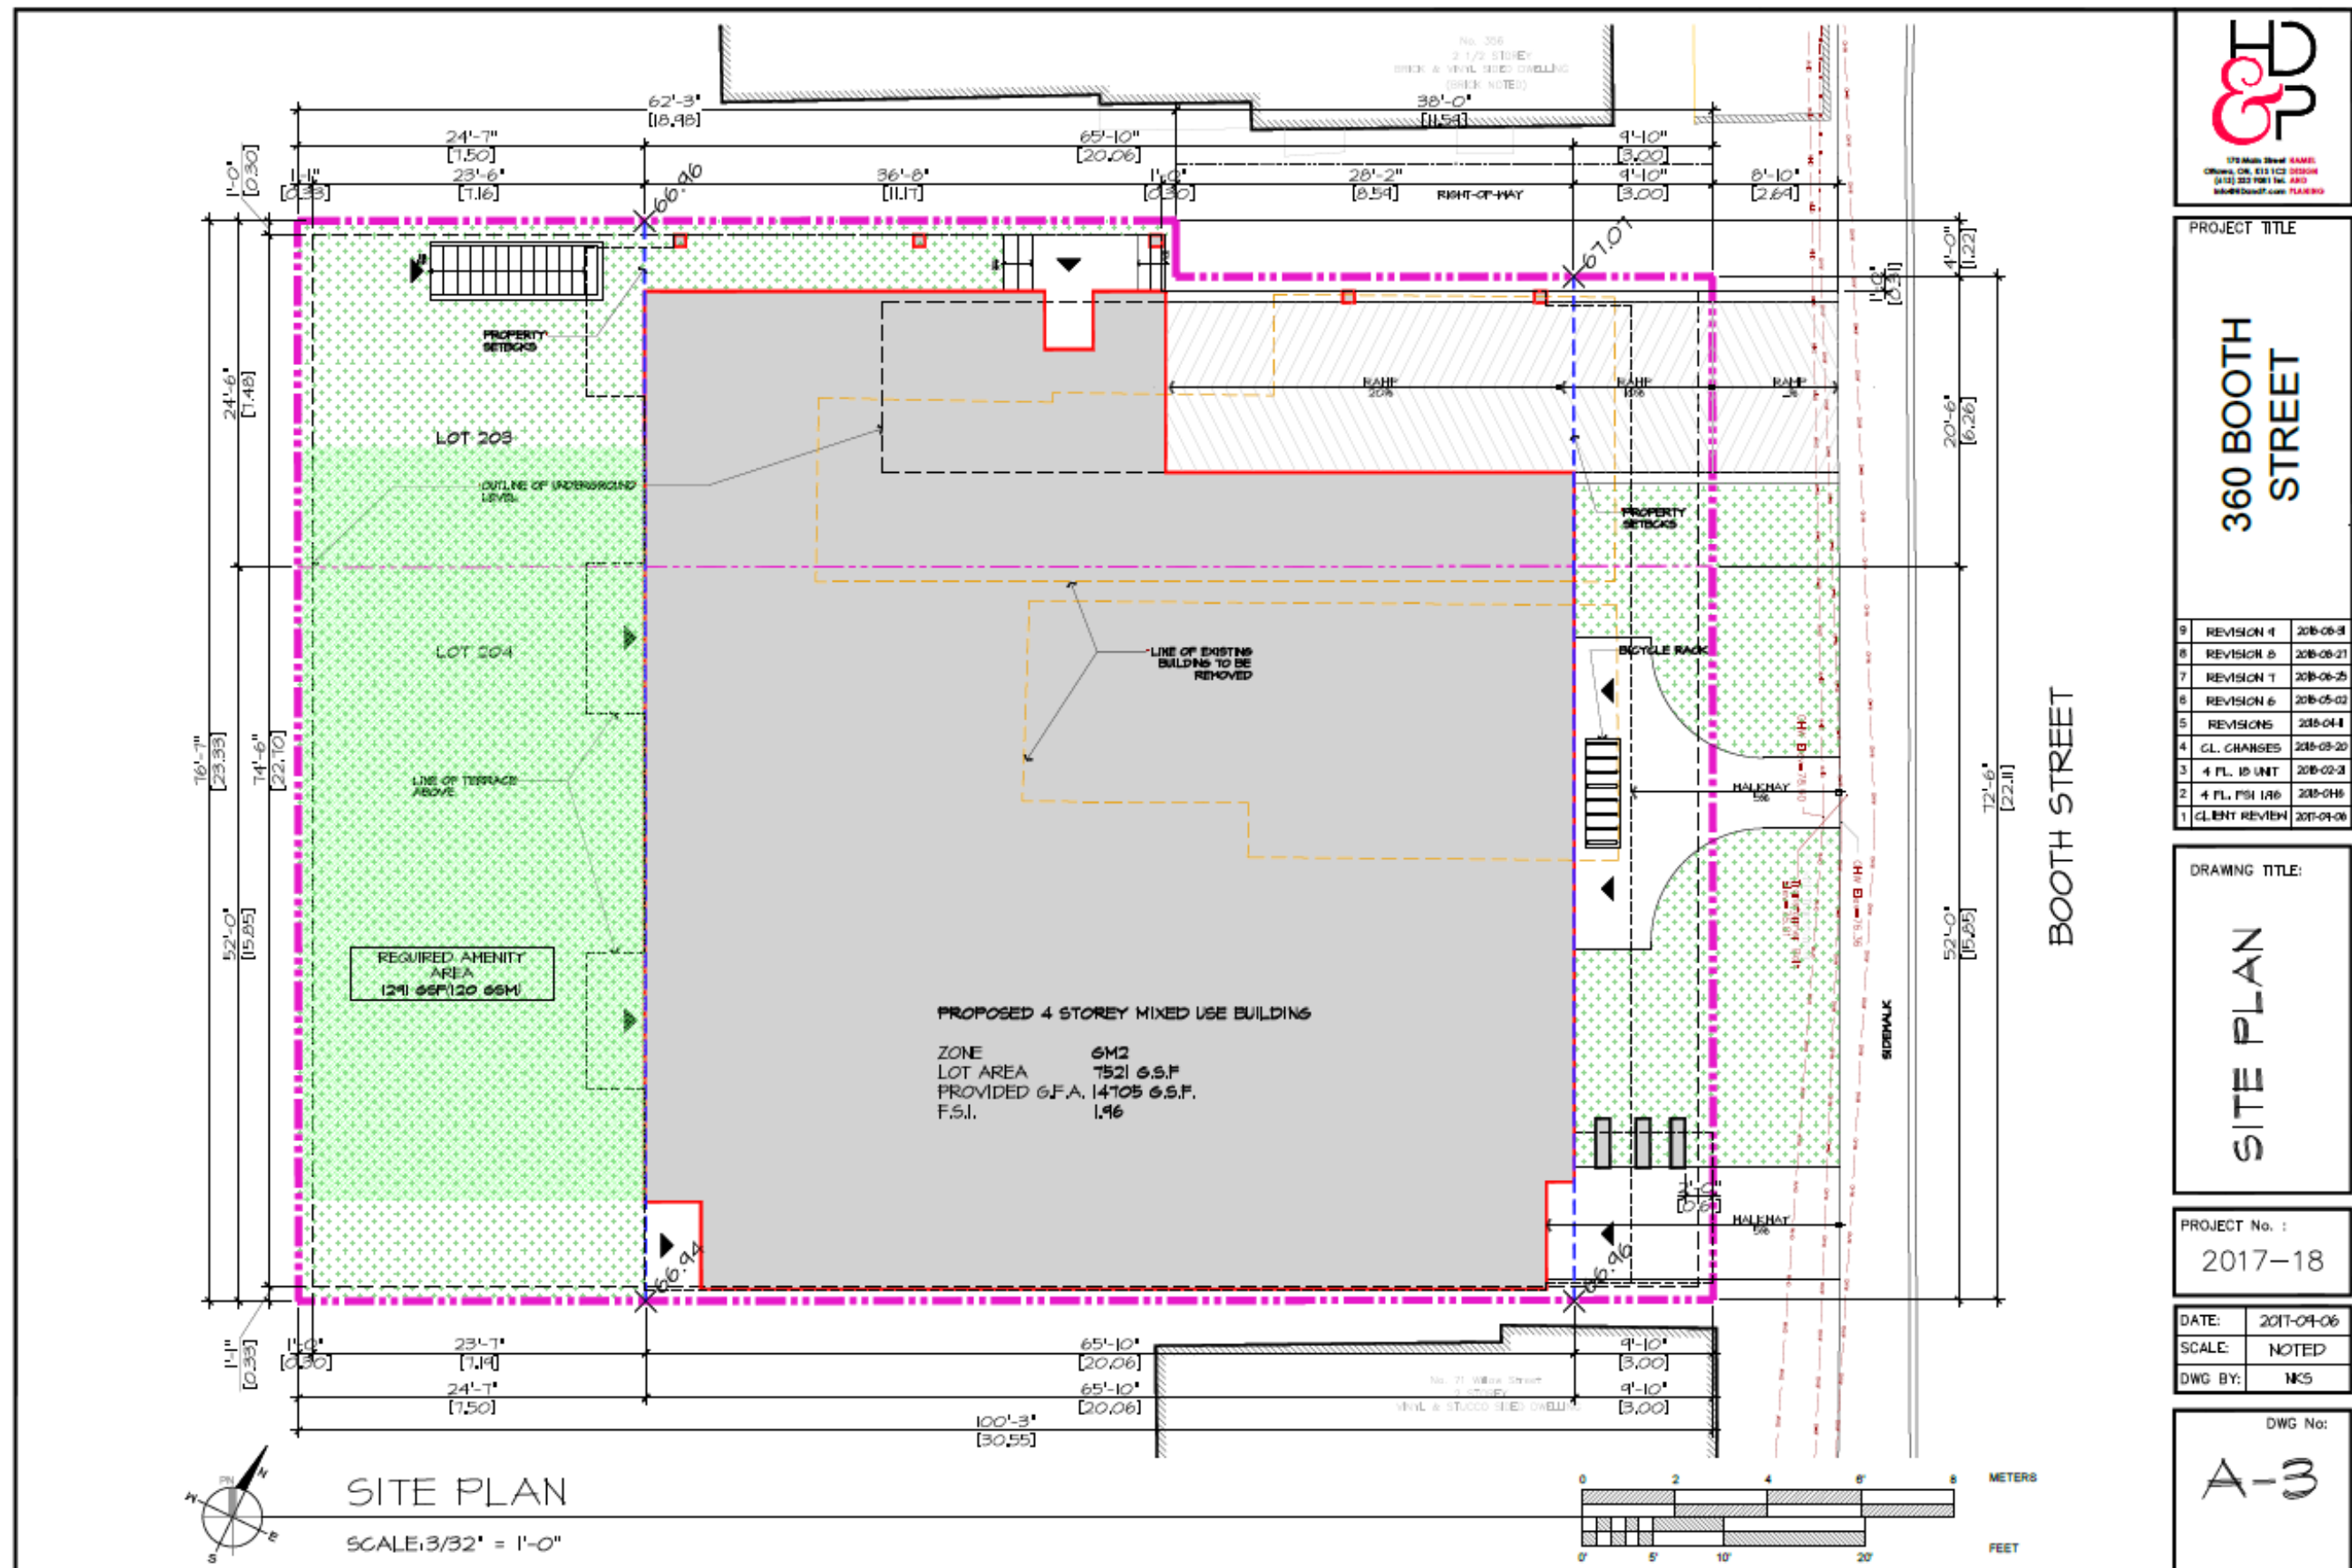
Proposed site plan prepared by Hamel Design & Planning
